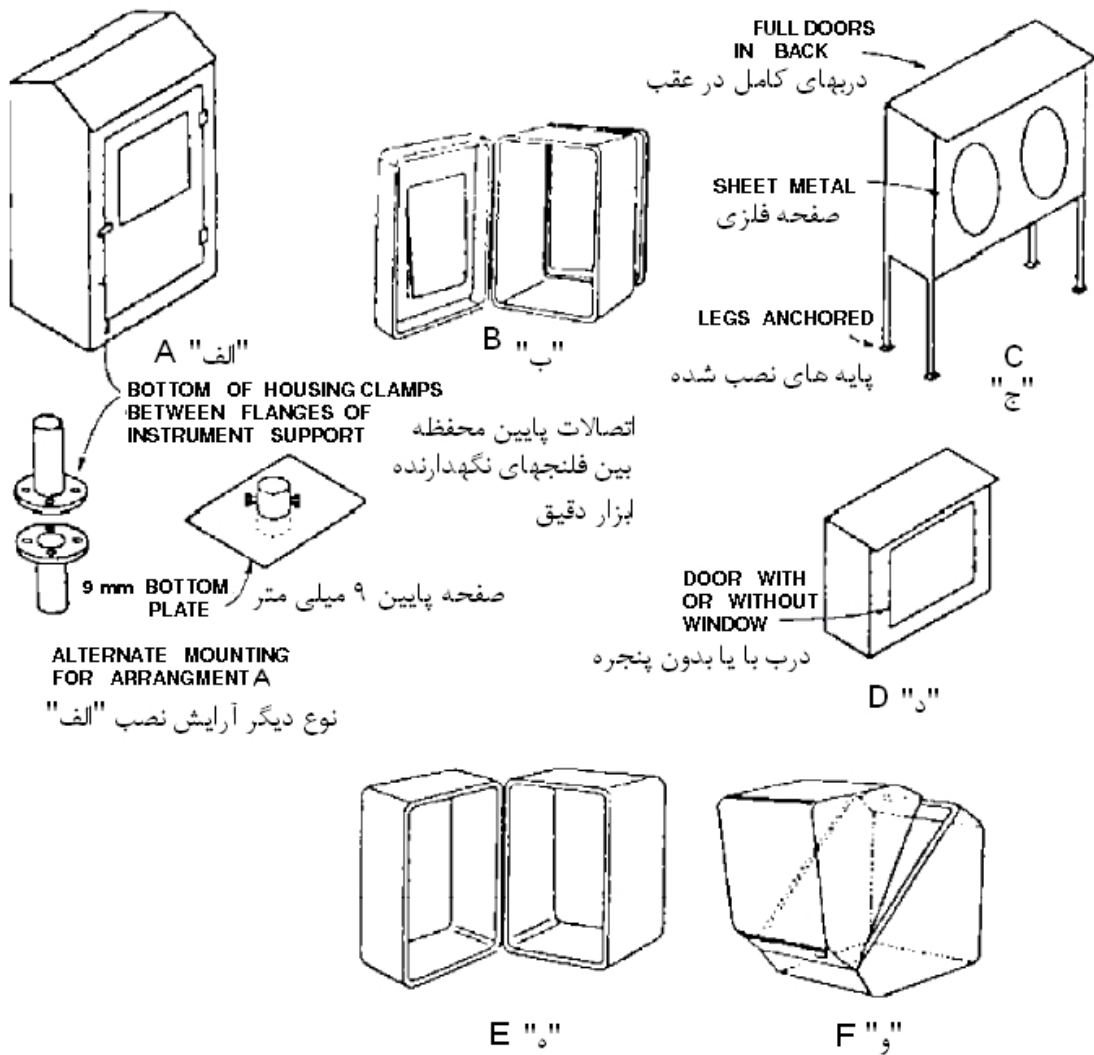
INSTRUMENT HOUSING AND MOUNTINGS
